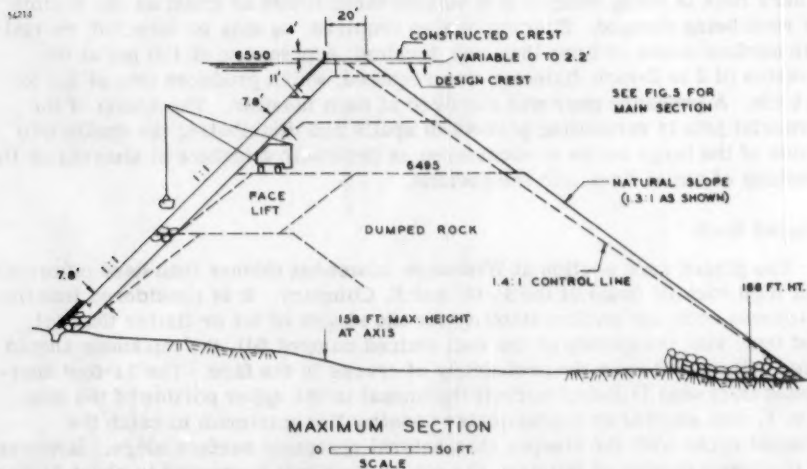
PROPOSED CONSTRUCTION-WING SECTION-WISHON DAM
